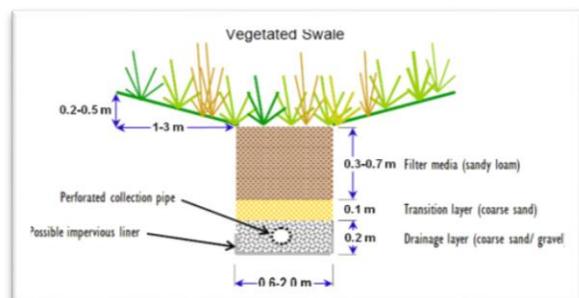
Cross section of typical bioretention swale (SEQHWP 2006)
